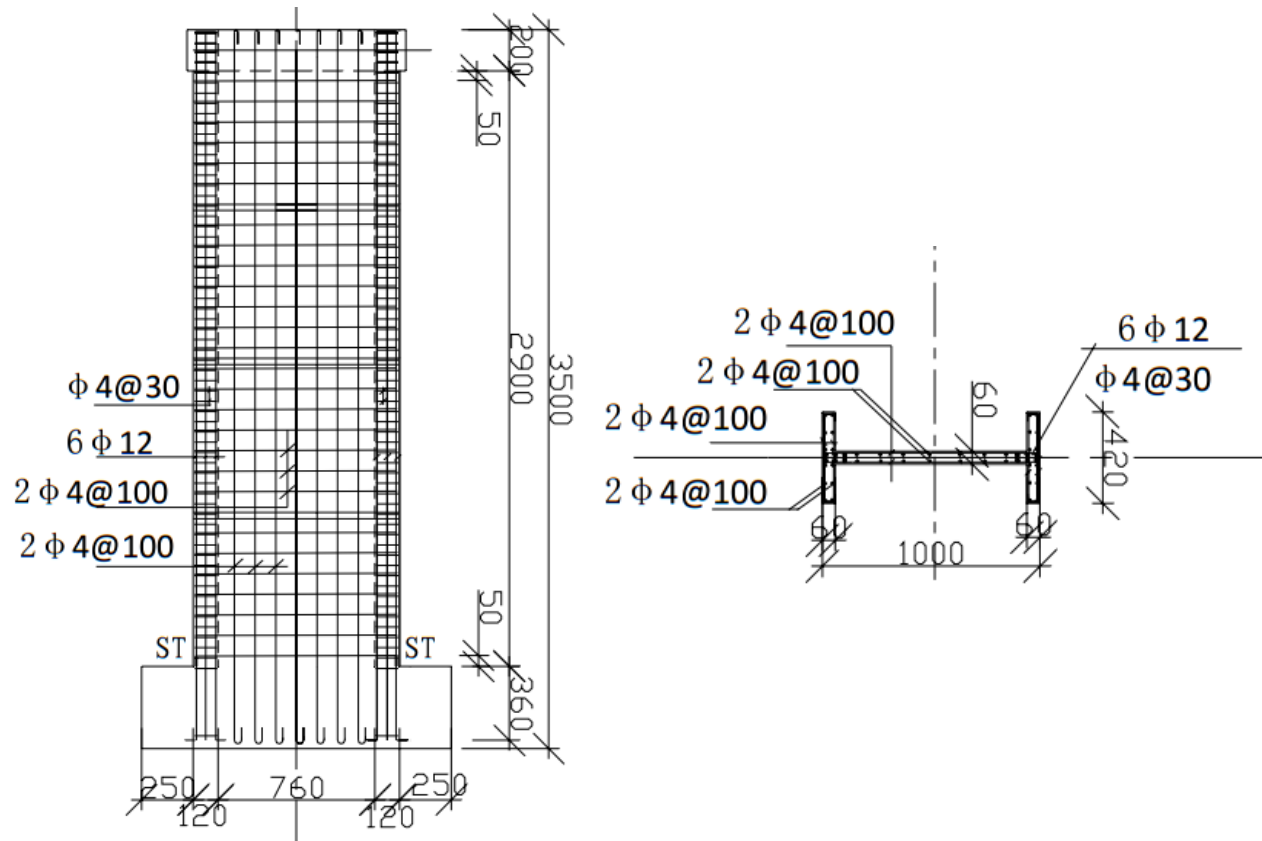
Test Specimen Geometry and Reinforcement Details for Shouzhong [157]
